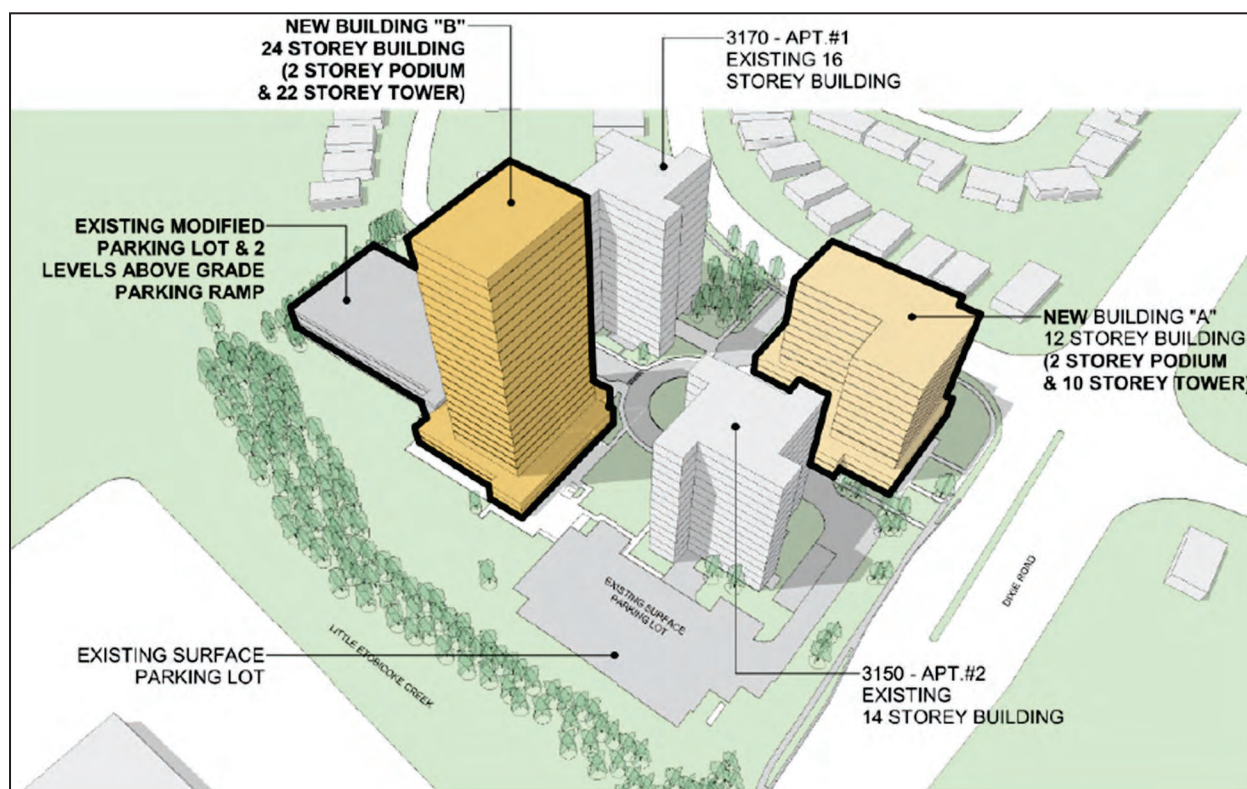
Conceptual Perspective of Existing and Proposed Apartment Buildings Looking North
